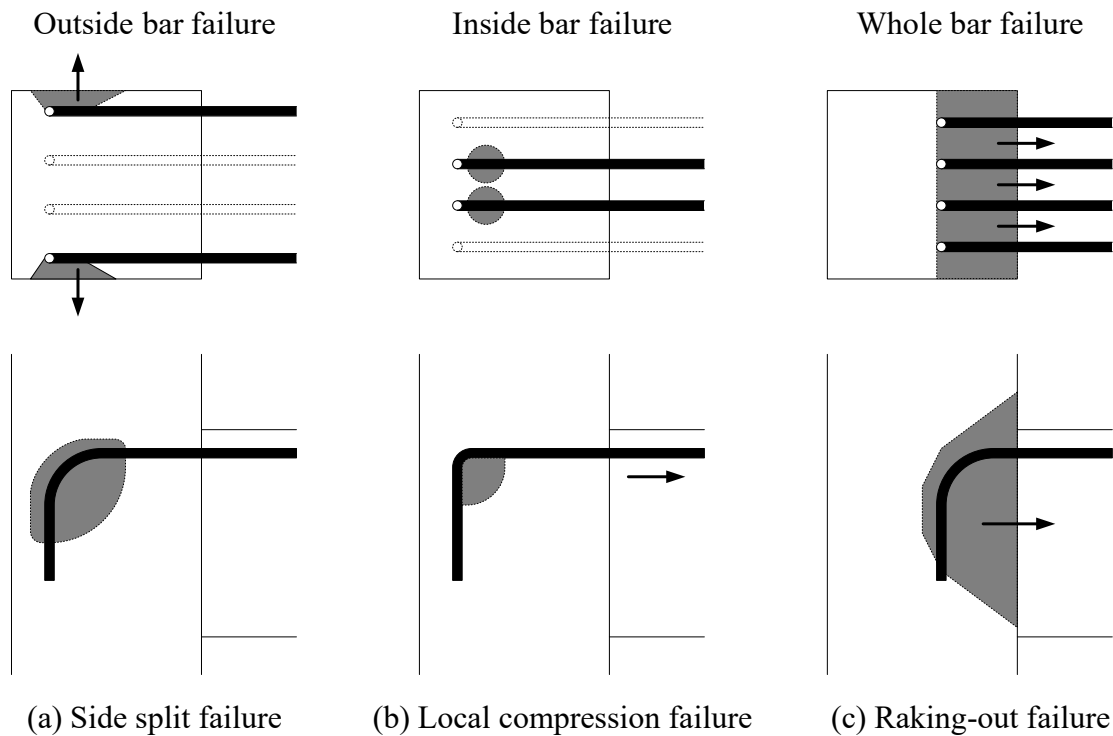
Anchorage failure mode using bent reinforcing bars
